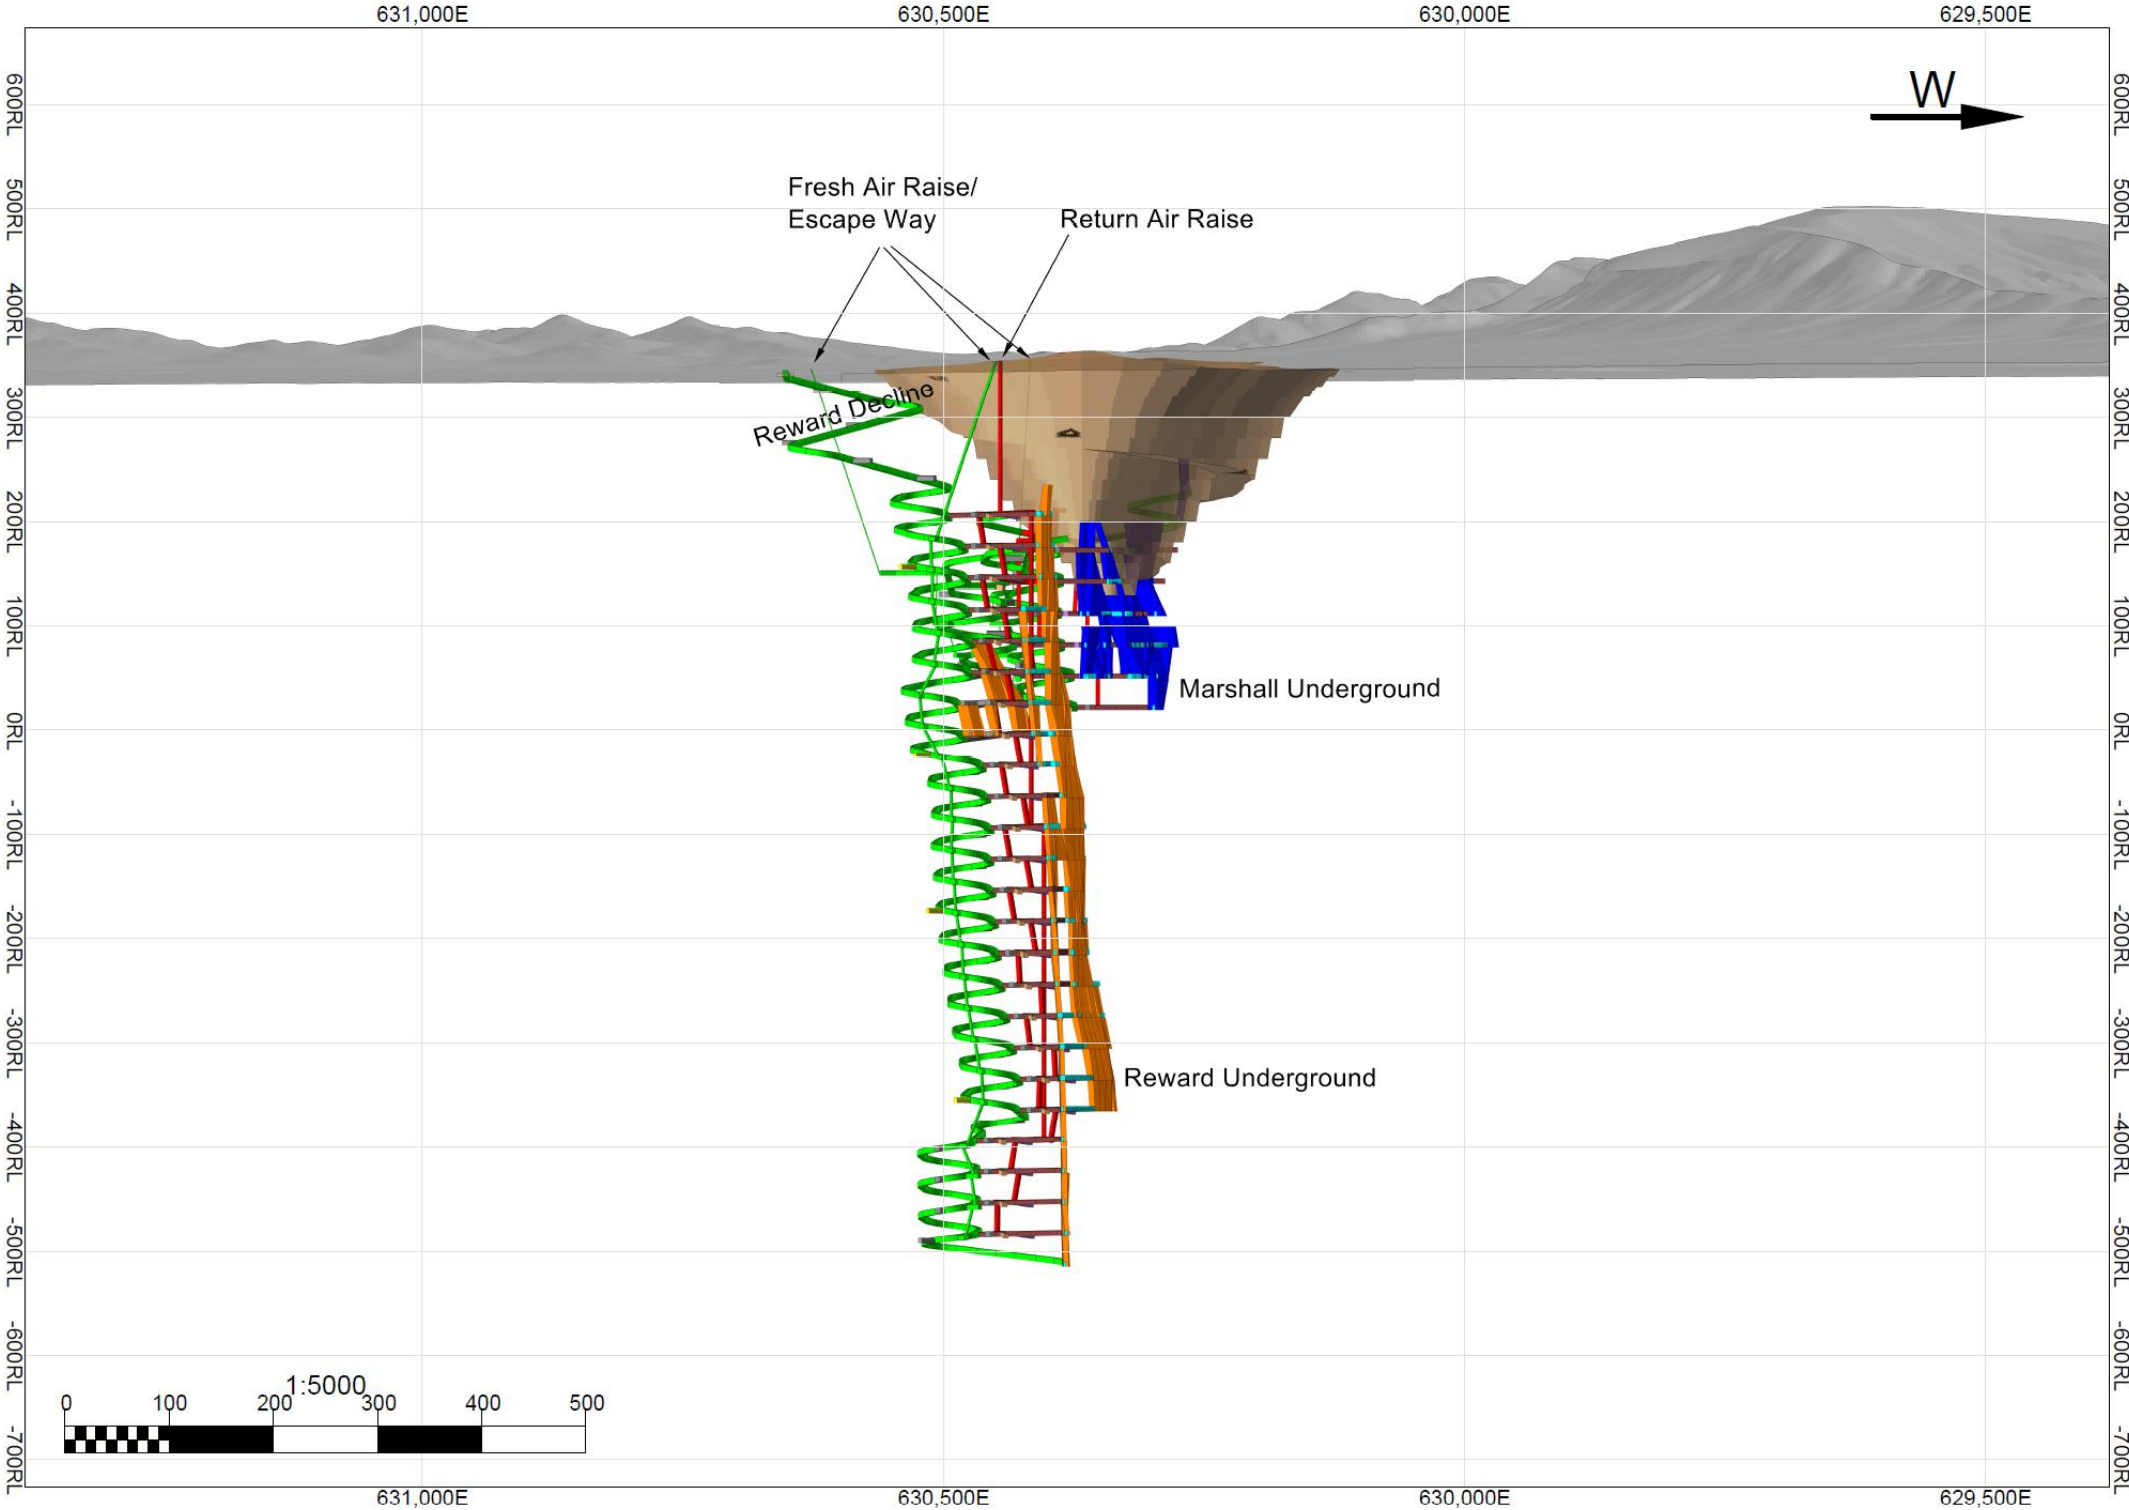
Reward and Marshall Underground Mine Designs – looking South
